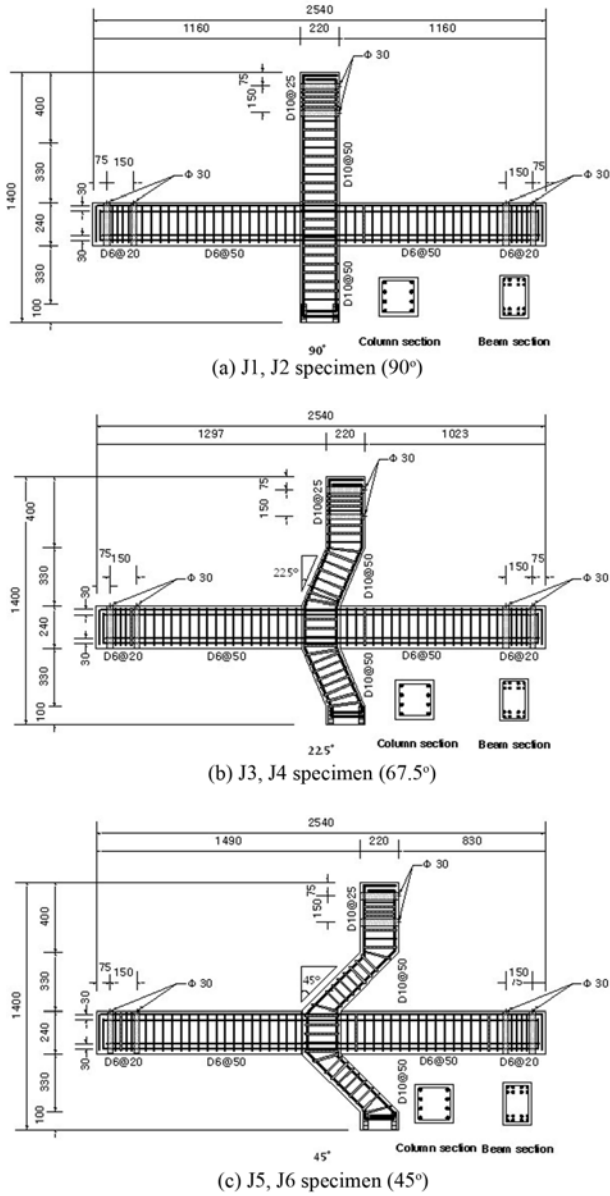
Geometry and reinforcing details of specimens (unit: mm)
